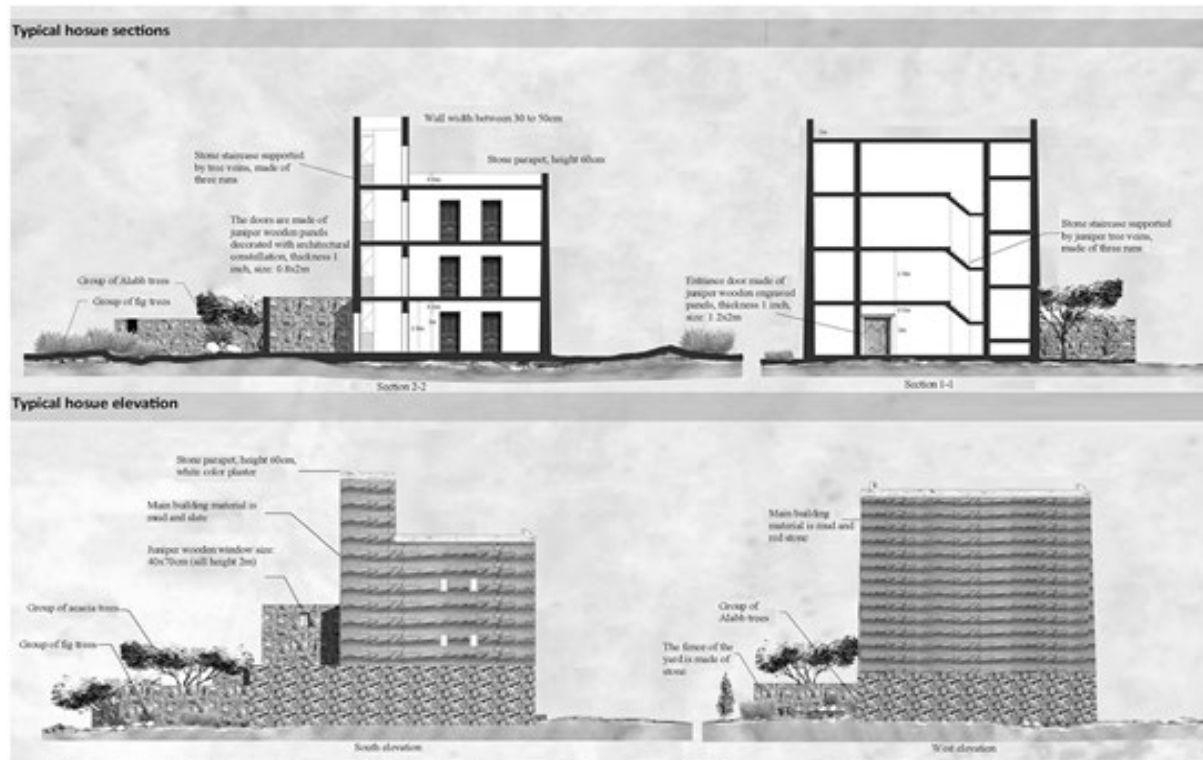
Wall sections and elevations of a typical Asiri house showing vertical organization, stone base, and mud walls with inserted slates. Work by author with students.
